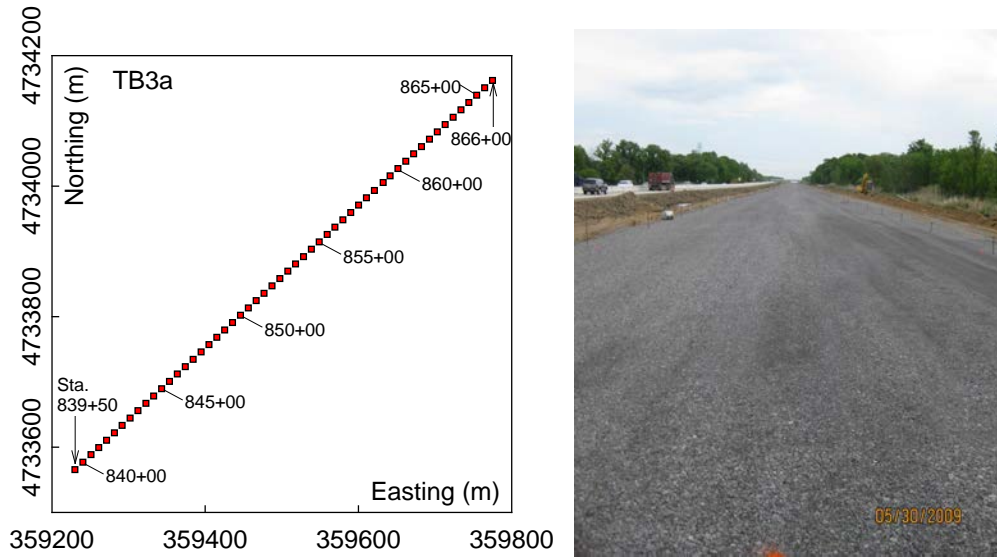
Plan view of in situ test locations on TS3-A (left) and photograph of TS3-A untrimmed OGDC base layer (right)
